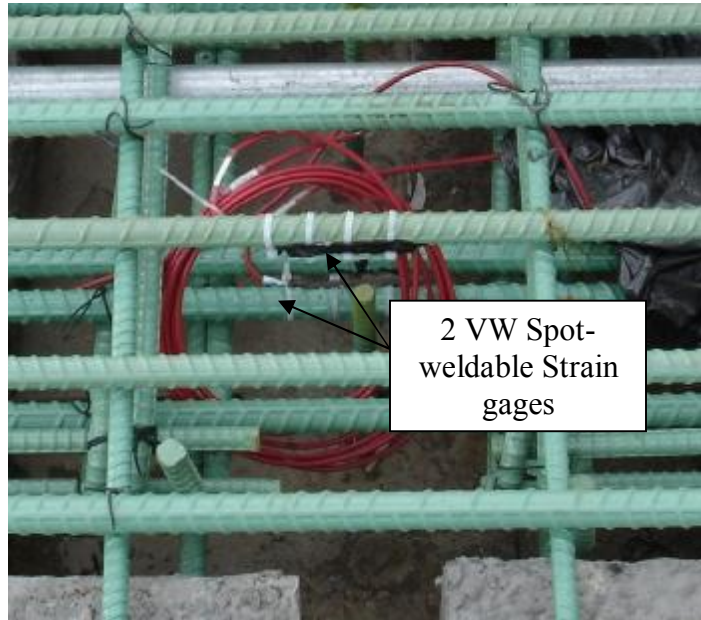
Photograph of 2 VW spot-weldable strain gages on longitudinal reinforcement located at the centerline of the pier cap
